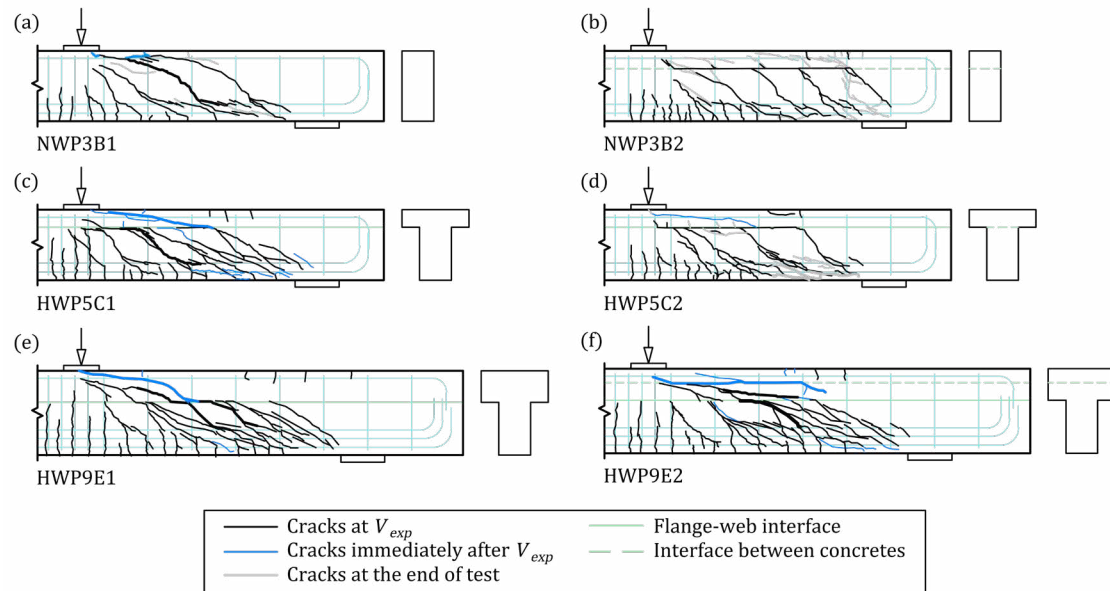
Crack pattern examples of specimens with web reinforcement: (a) monolithic rectangular specimen B1 [24]; (b) composite rectangular specimen B2 [24]; (c) monolithic T-shaped specimen C1 [25]; (d) composite T-shaped specimen C2 [25]; (e) monolithic T-shaped specimen E1; (f) composite T-shaped specimen E2.
